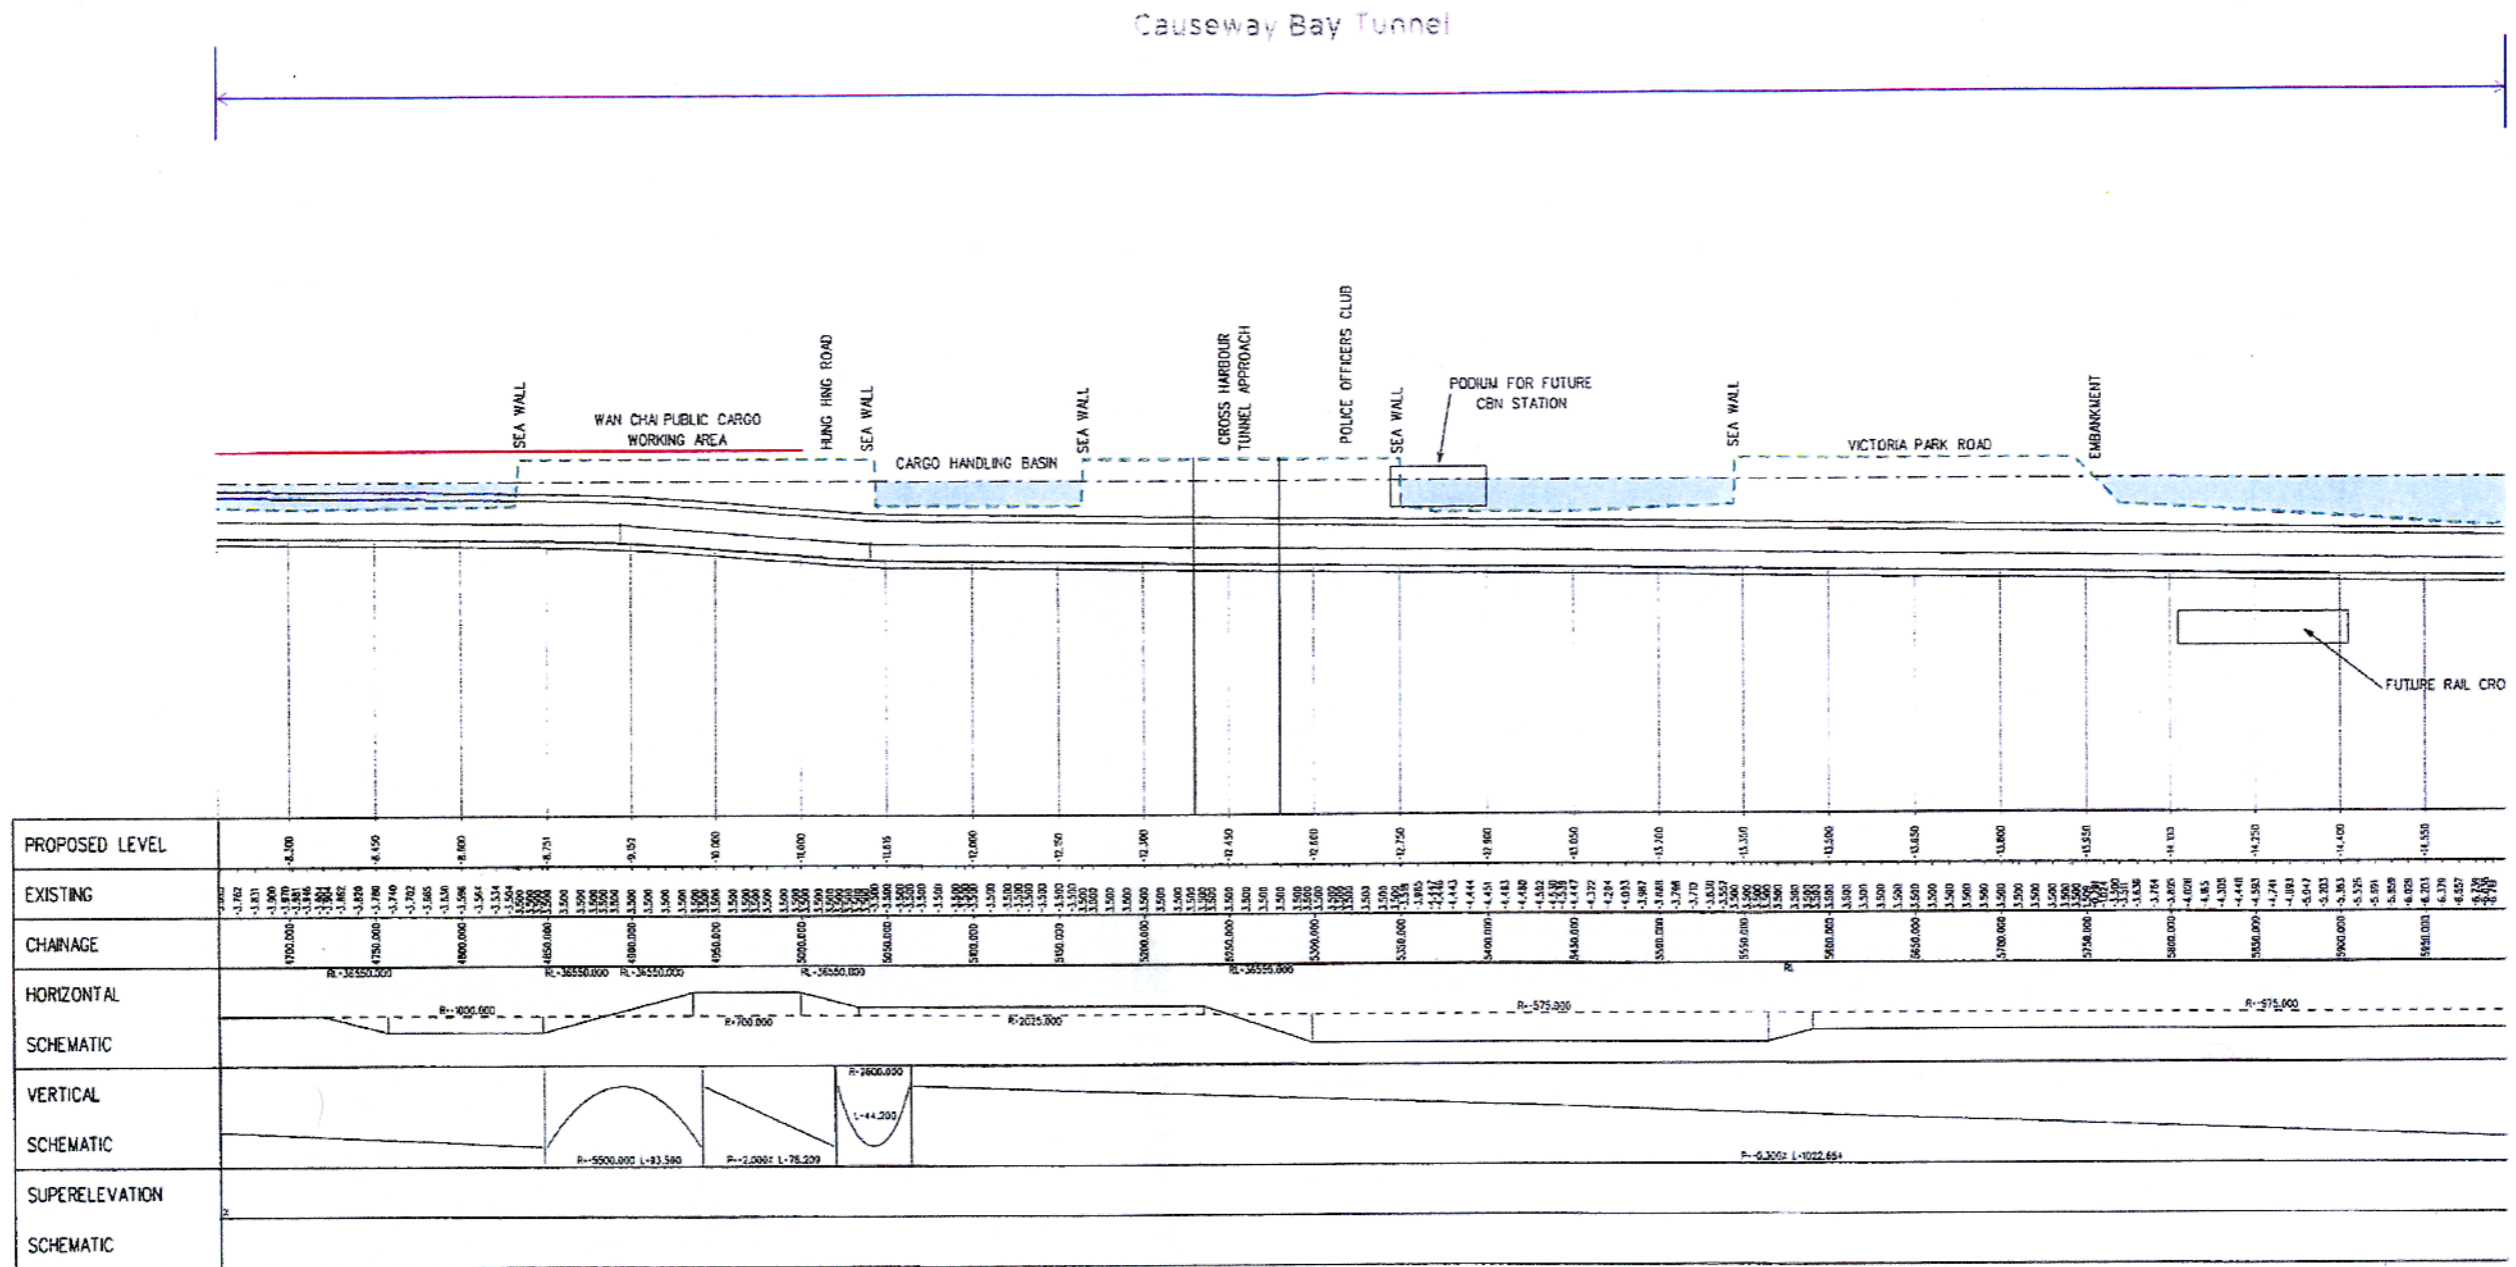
Vertical Elevation of Bypass (3 of 4)
